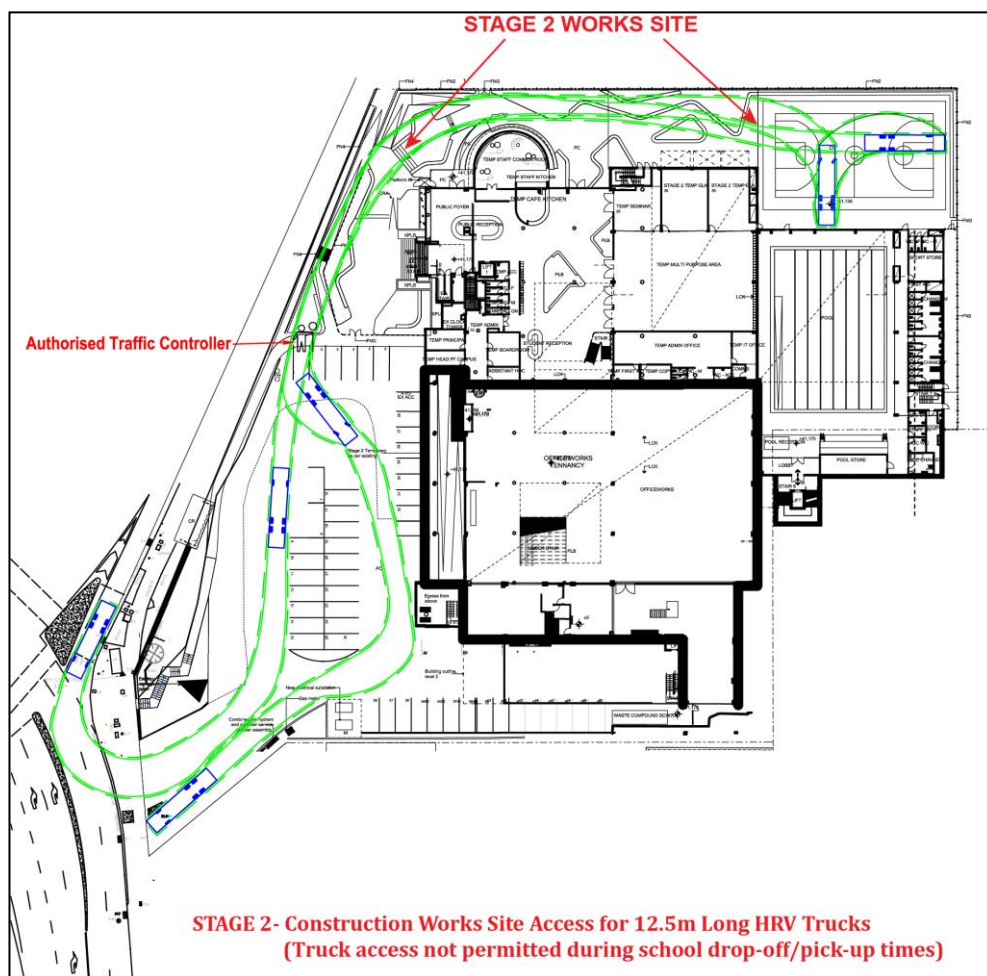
Stage 2 Construction Access for 12.5m Long HRV Trucks
